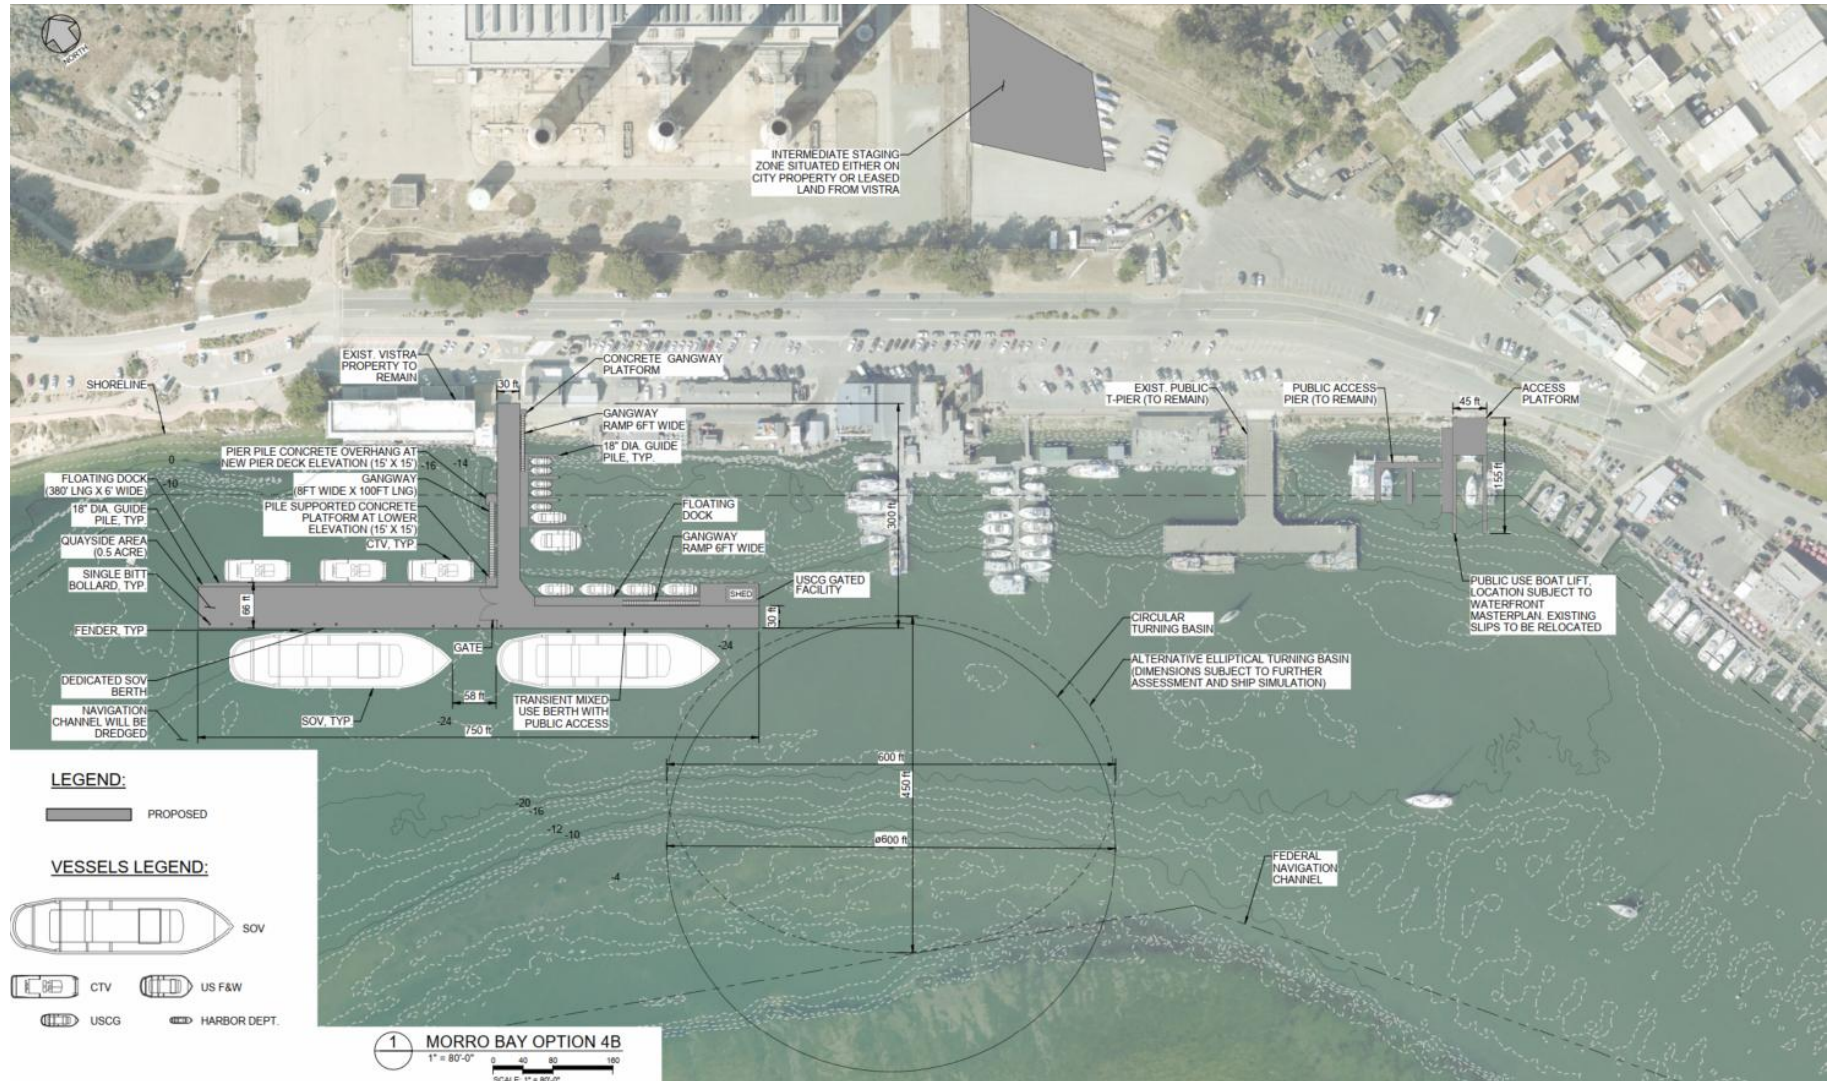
Morro Bay Option 4B Conceptual Plan
